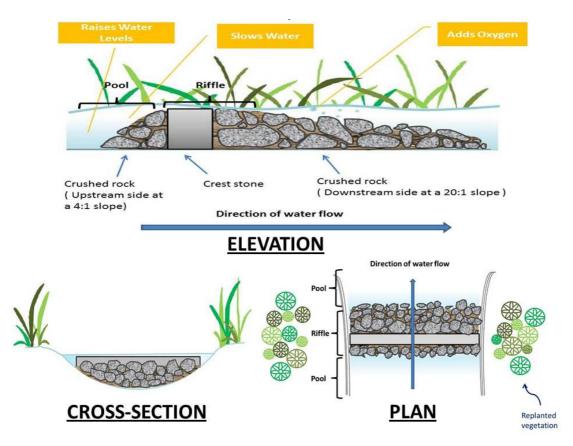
PLAN, ELEVATION AND CROSS-SECTION VIEWS OF A BOULDER WEIR AND ITS MAIN FUNCTIONS
